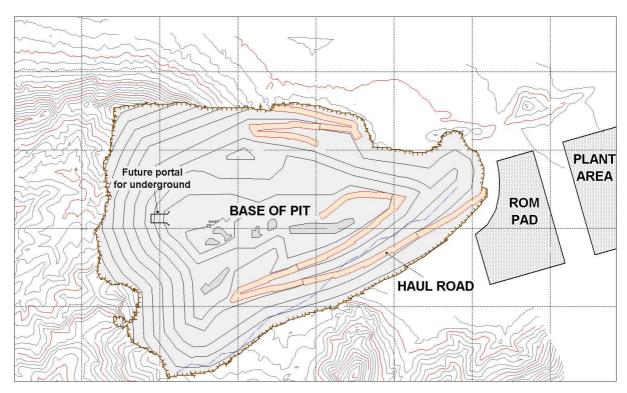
Simplified Version of Open Cut Mine Plan (Showing haul roads & ROM PAD)
